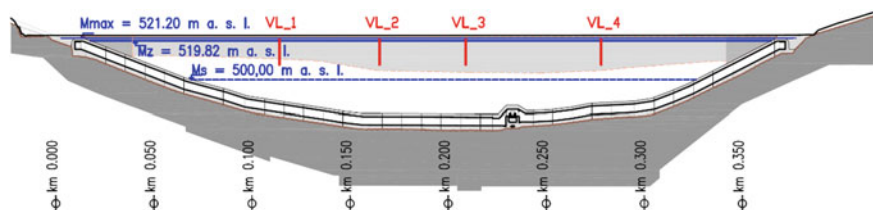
Longitudinal section through the grouting gallery—the situation of the dam sealing wall and EIS monitoring probes
